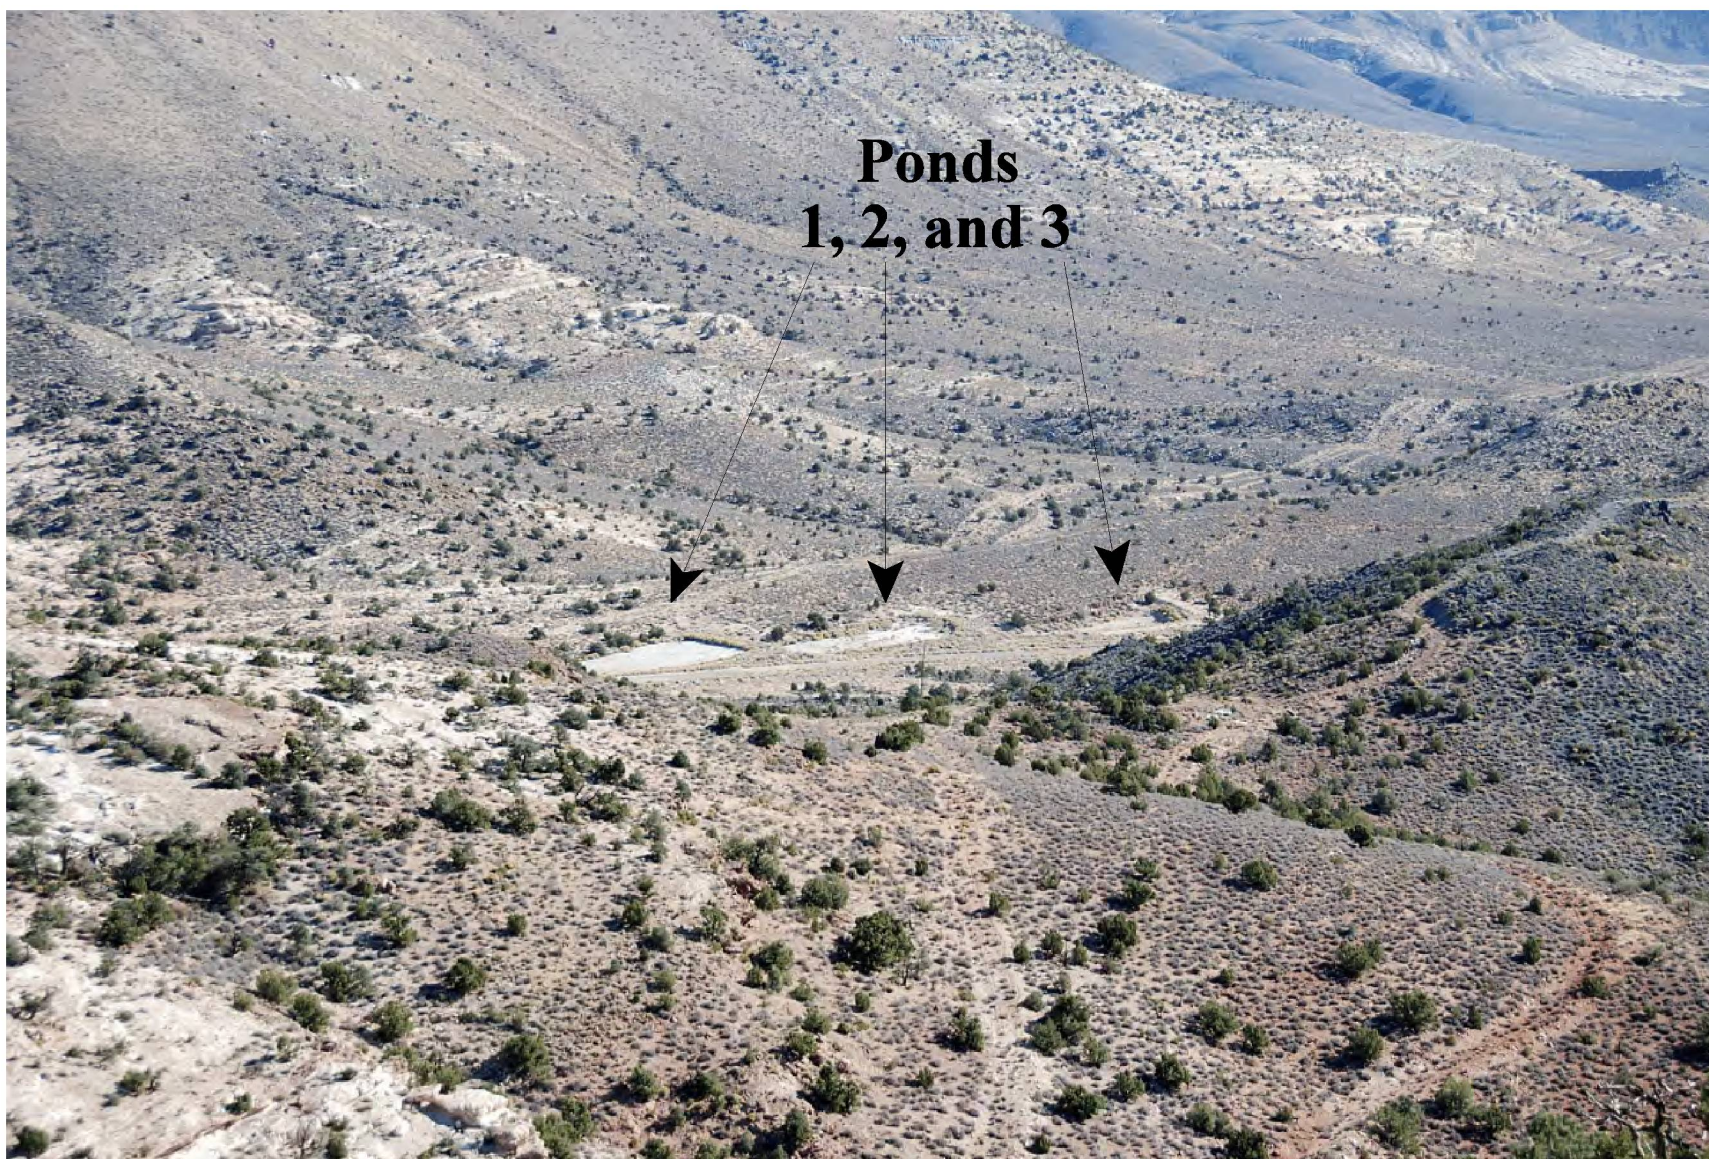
Overview of the U12n Tunnel complex retention pond area, view northeast (2008).
